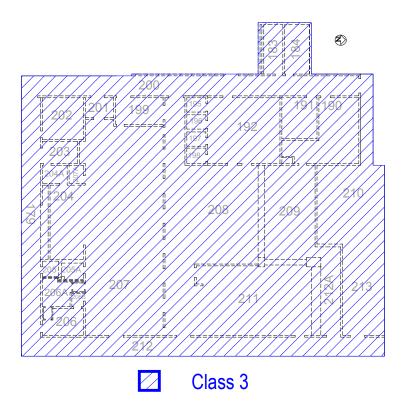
BMS B-124 New Section Class 3 Area Above False Ceilings
